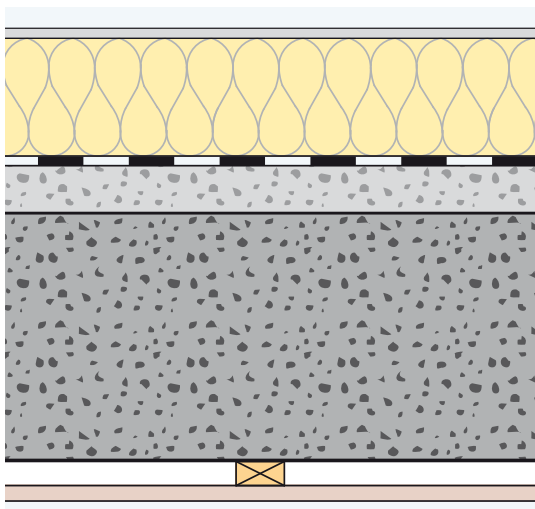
150mm dense concrete deck and 50mm screed with suspended 12.5mm plasterboard ceiling
